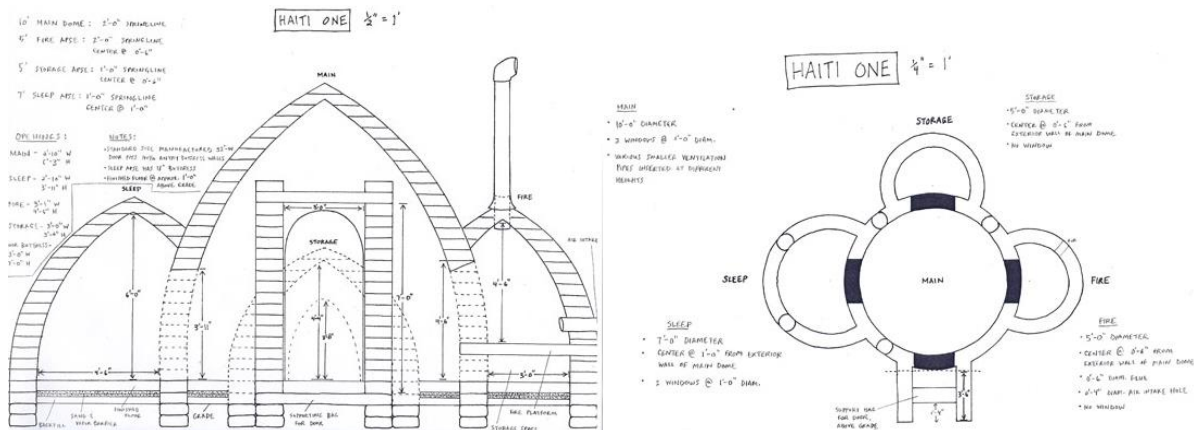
Sketch of the floor plan and Section of Haiti (Naidoo, 2010)
